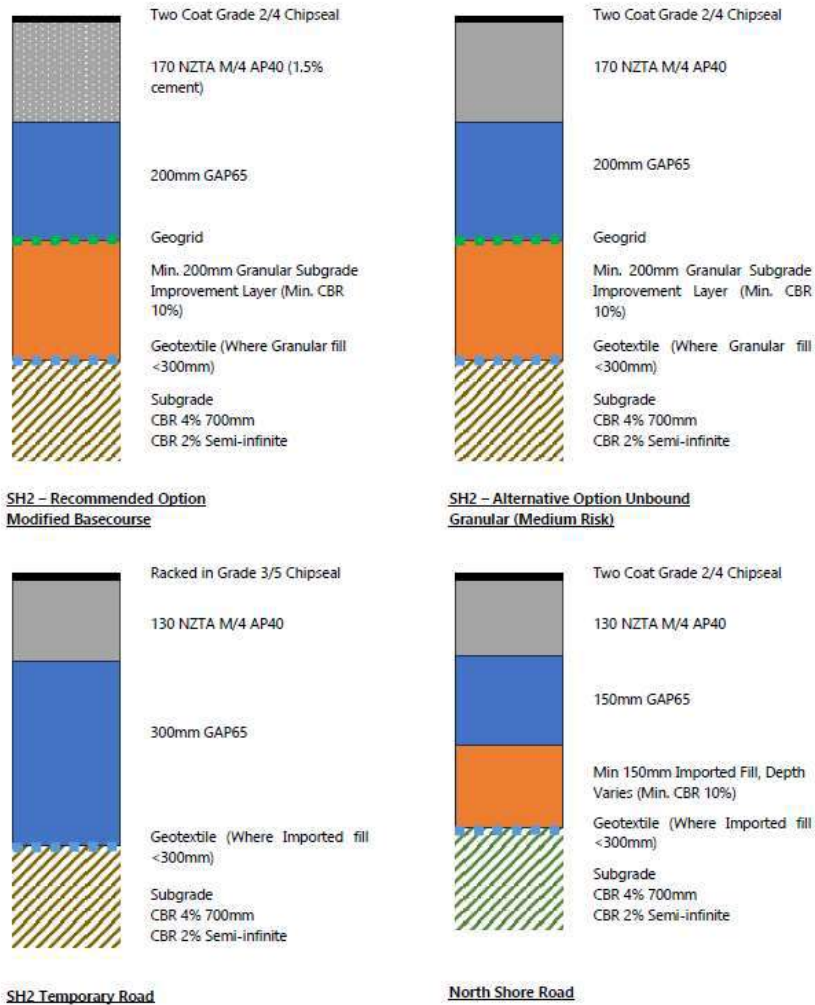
Pavement Design Summary (Source: Pinnacles Pavement Design Report)
